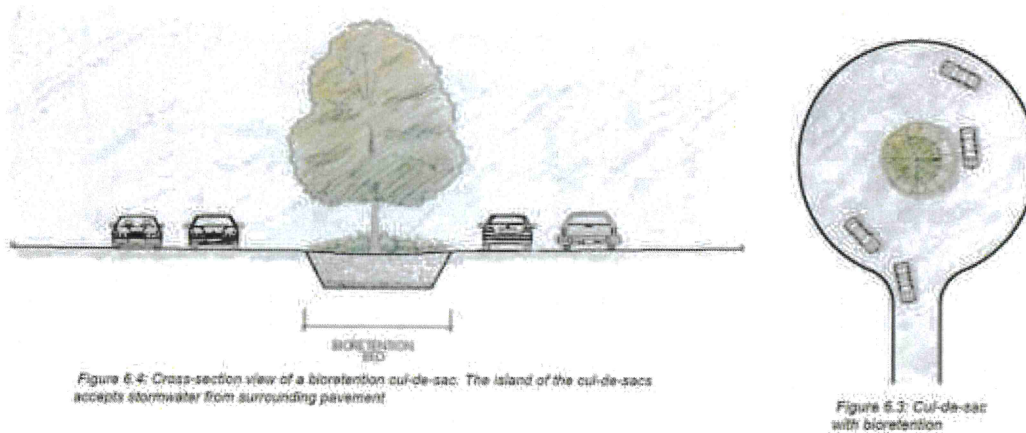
Section and Plan: cul-de-sac with bioretention (Philadelphia Water Department)
